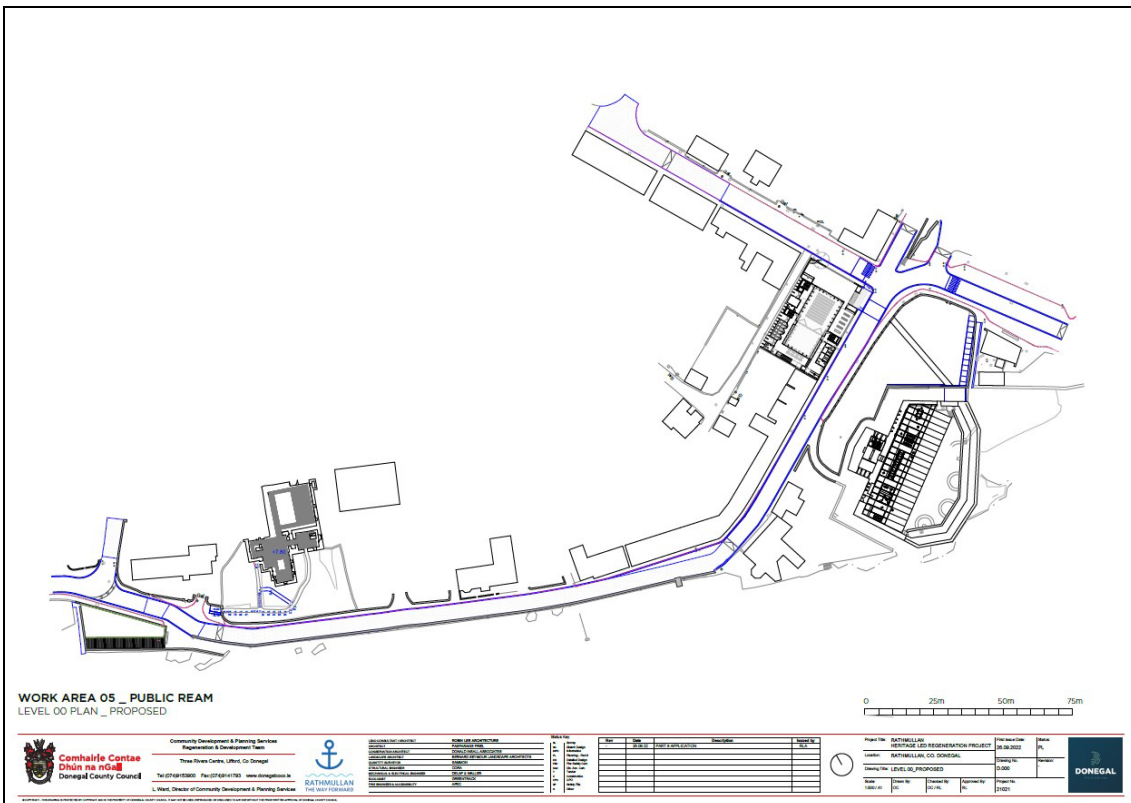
Plan of the proposed public realm enhancement scheme on Main Street and Pier Road.
